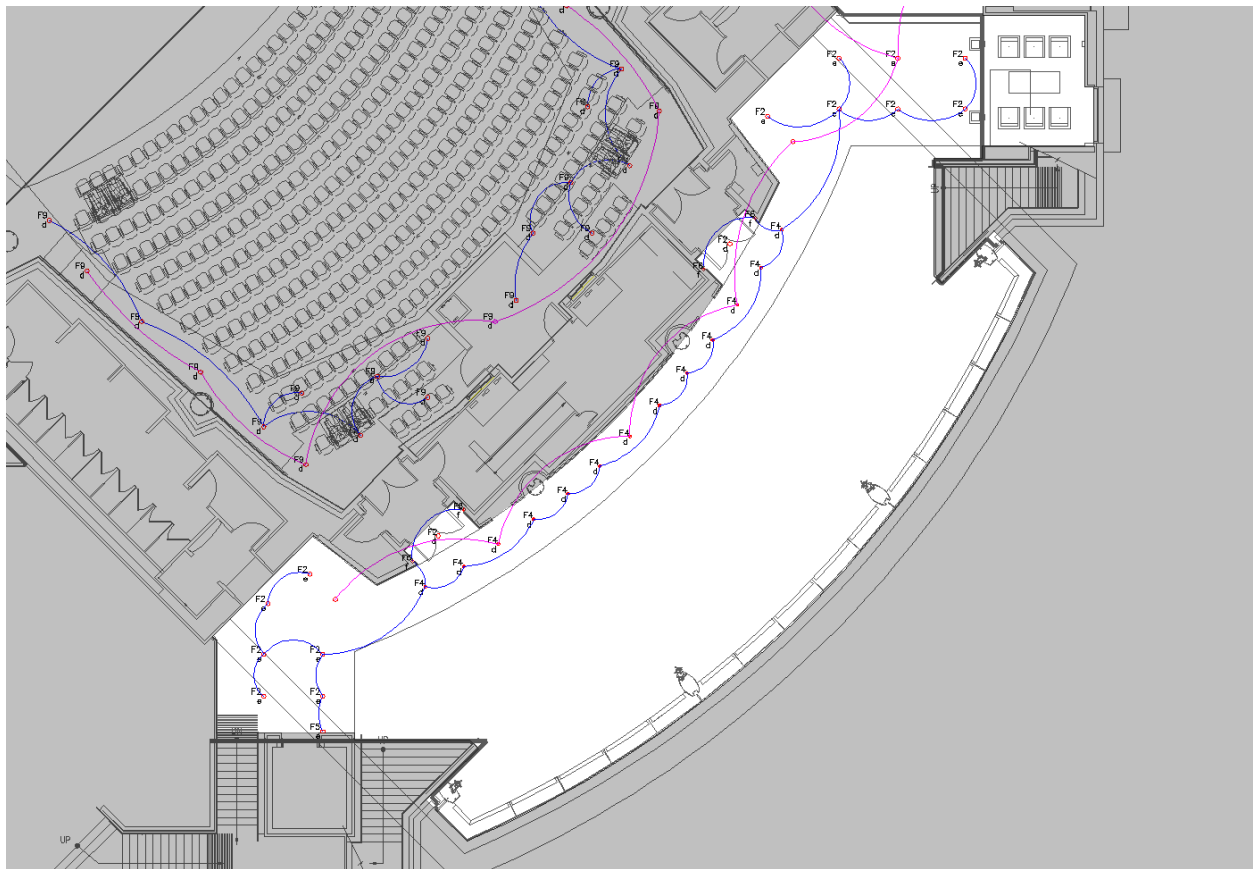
Main Lobby – Balcony Level North Lighting Plan
